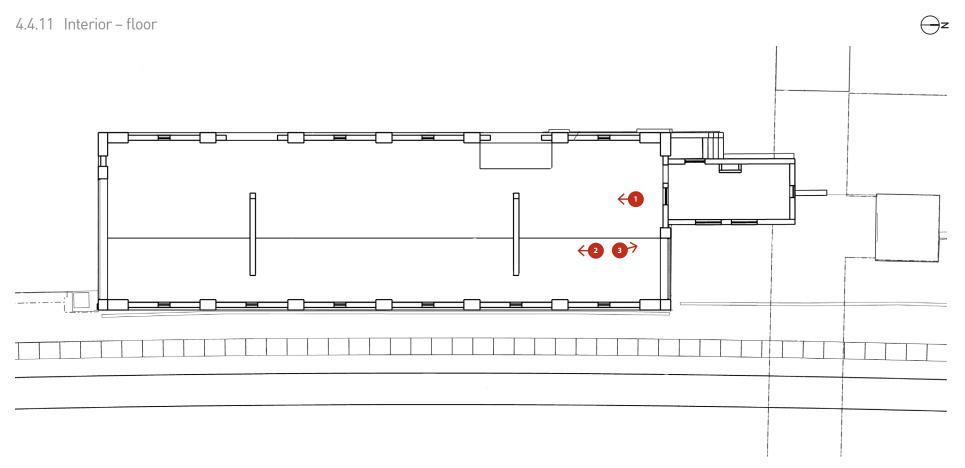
Key plan showing location and direction of photos of the interior floor of the Goods Shed
